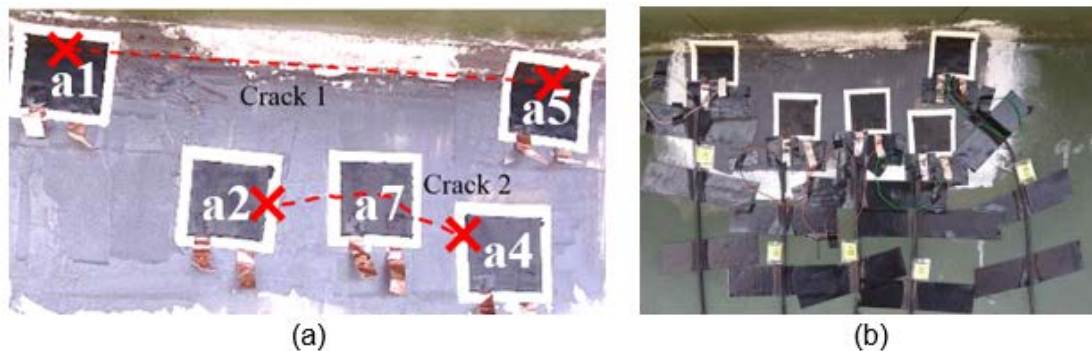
(a) Arrangement of the SEC Arrays; (b) SEC Arrays after Soldering the Cables
